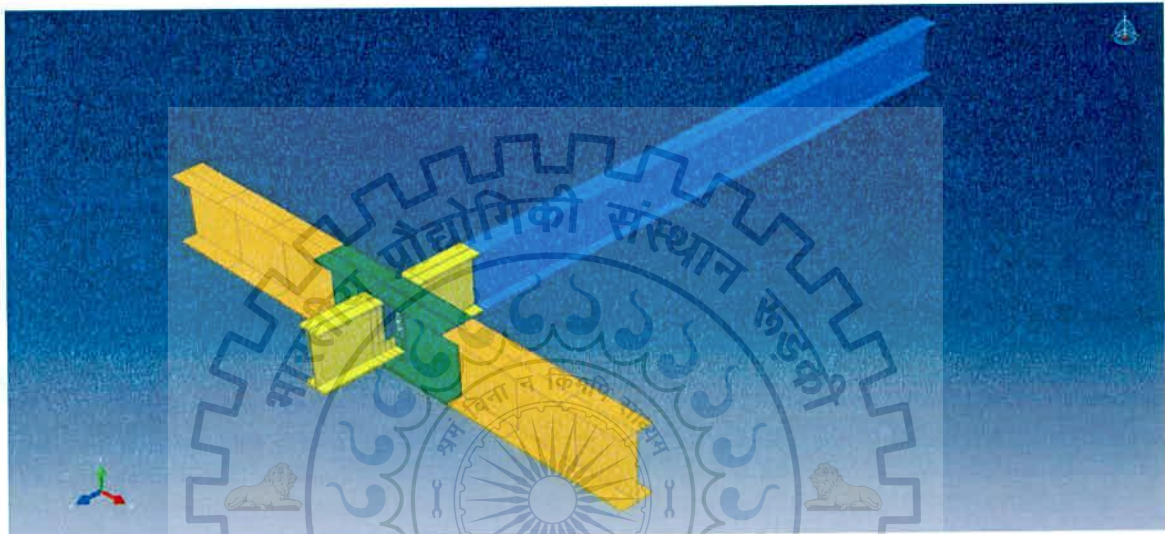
Assembly of the connection model for checking the joint rigidity
